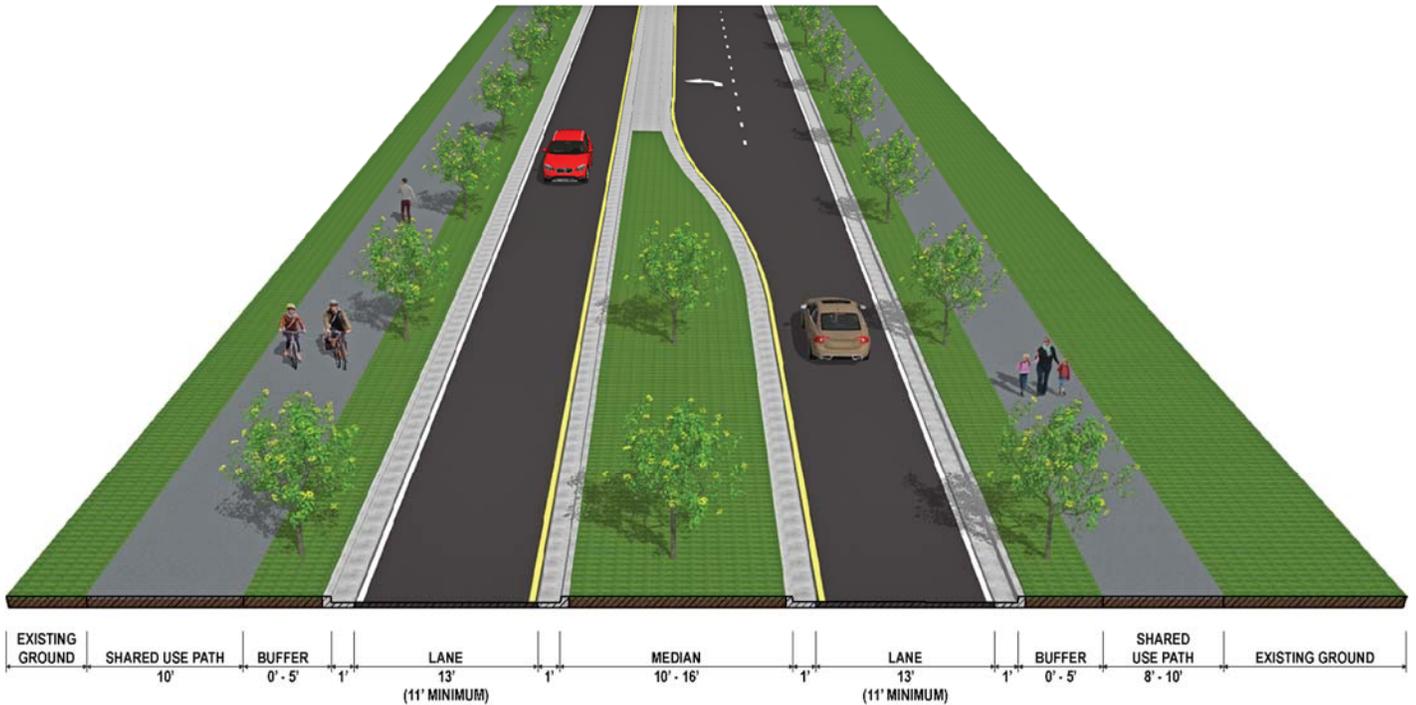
MD 924 Two Lane Typical Section with Median (looking north) – N.T.S.
